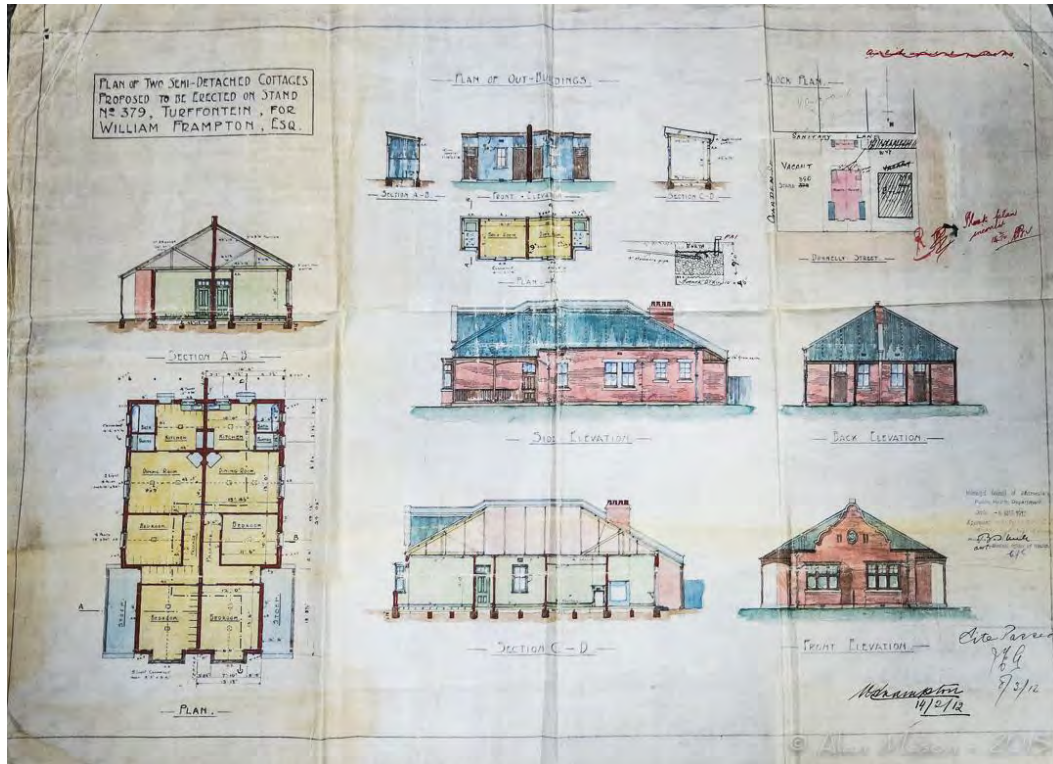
Original plan of proposed semi-detached cottages from 1912
